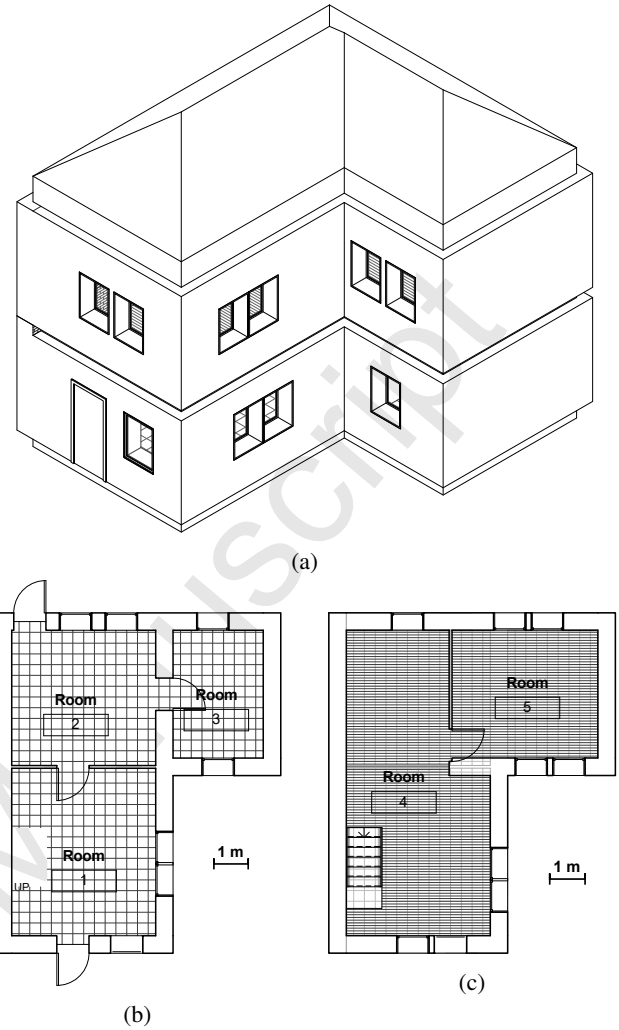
Geometric drawing of the sample two-story residential building showing: (a) 3-D outside view of the building, (b) the first floor plan, and (c) the second floor plan.
